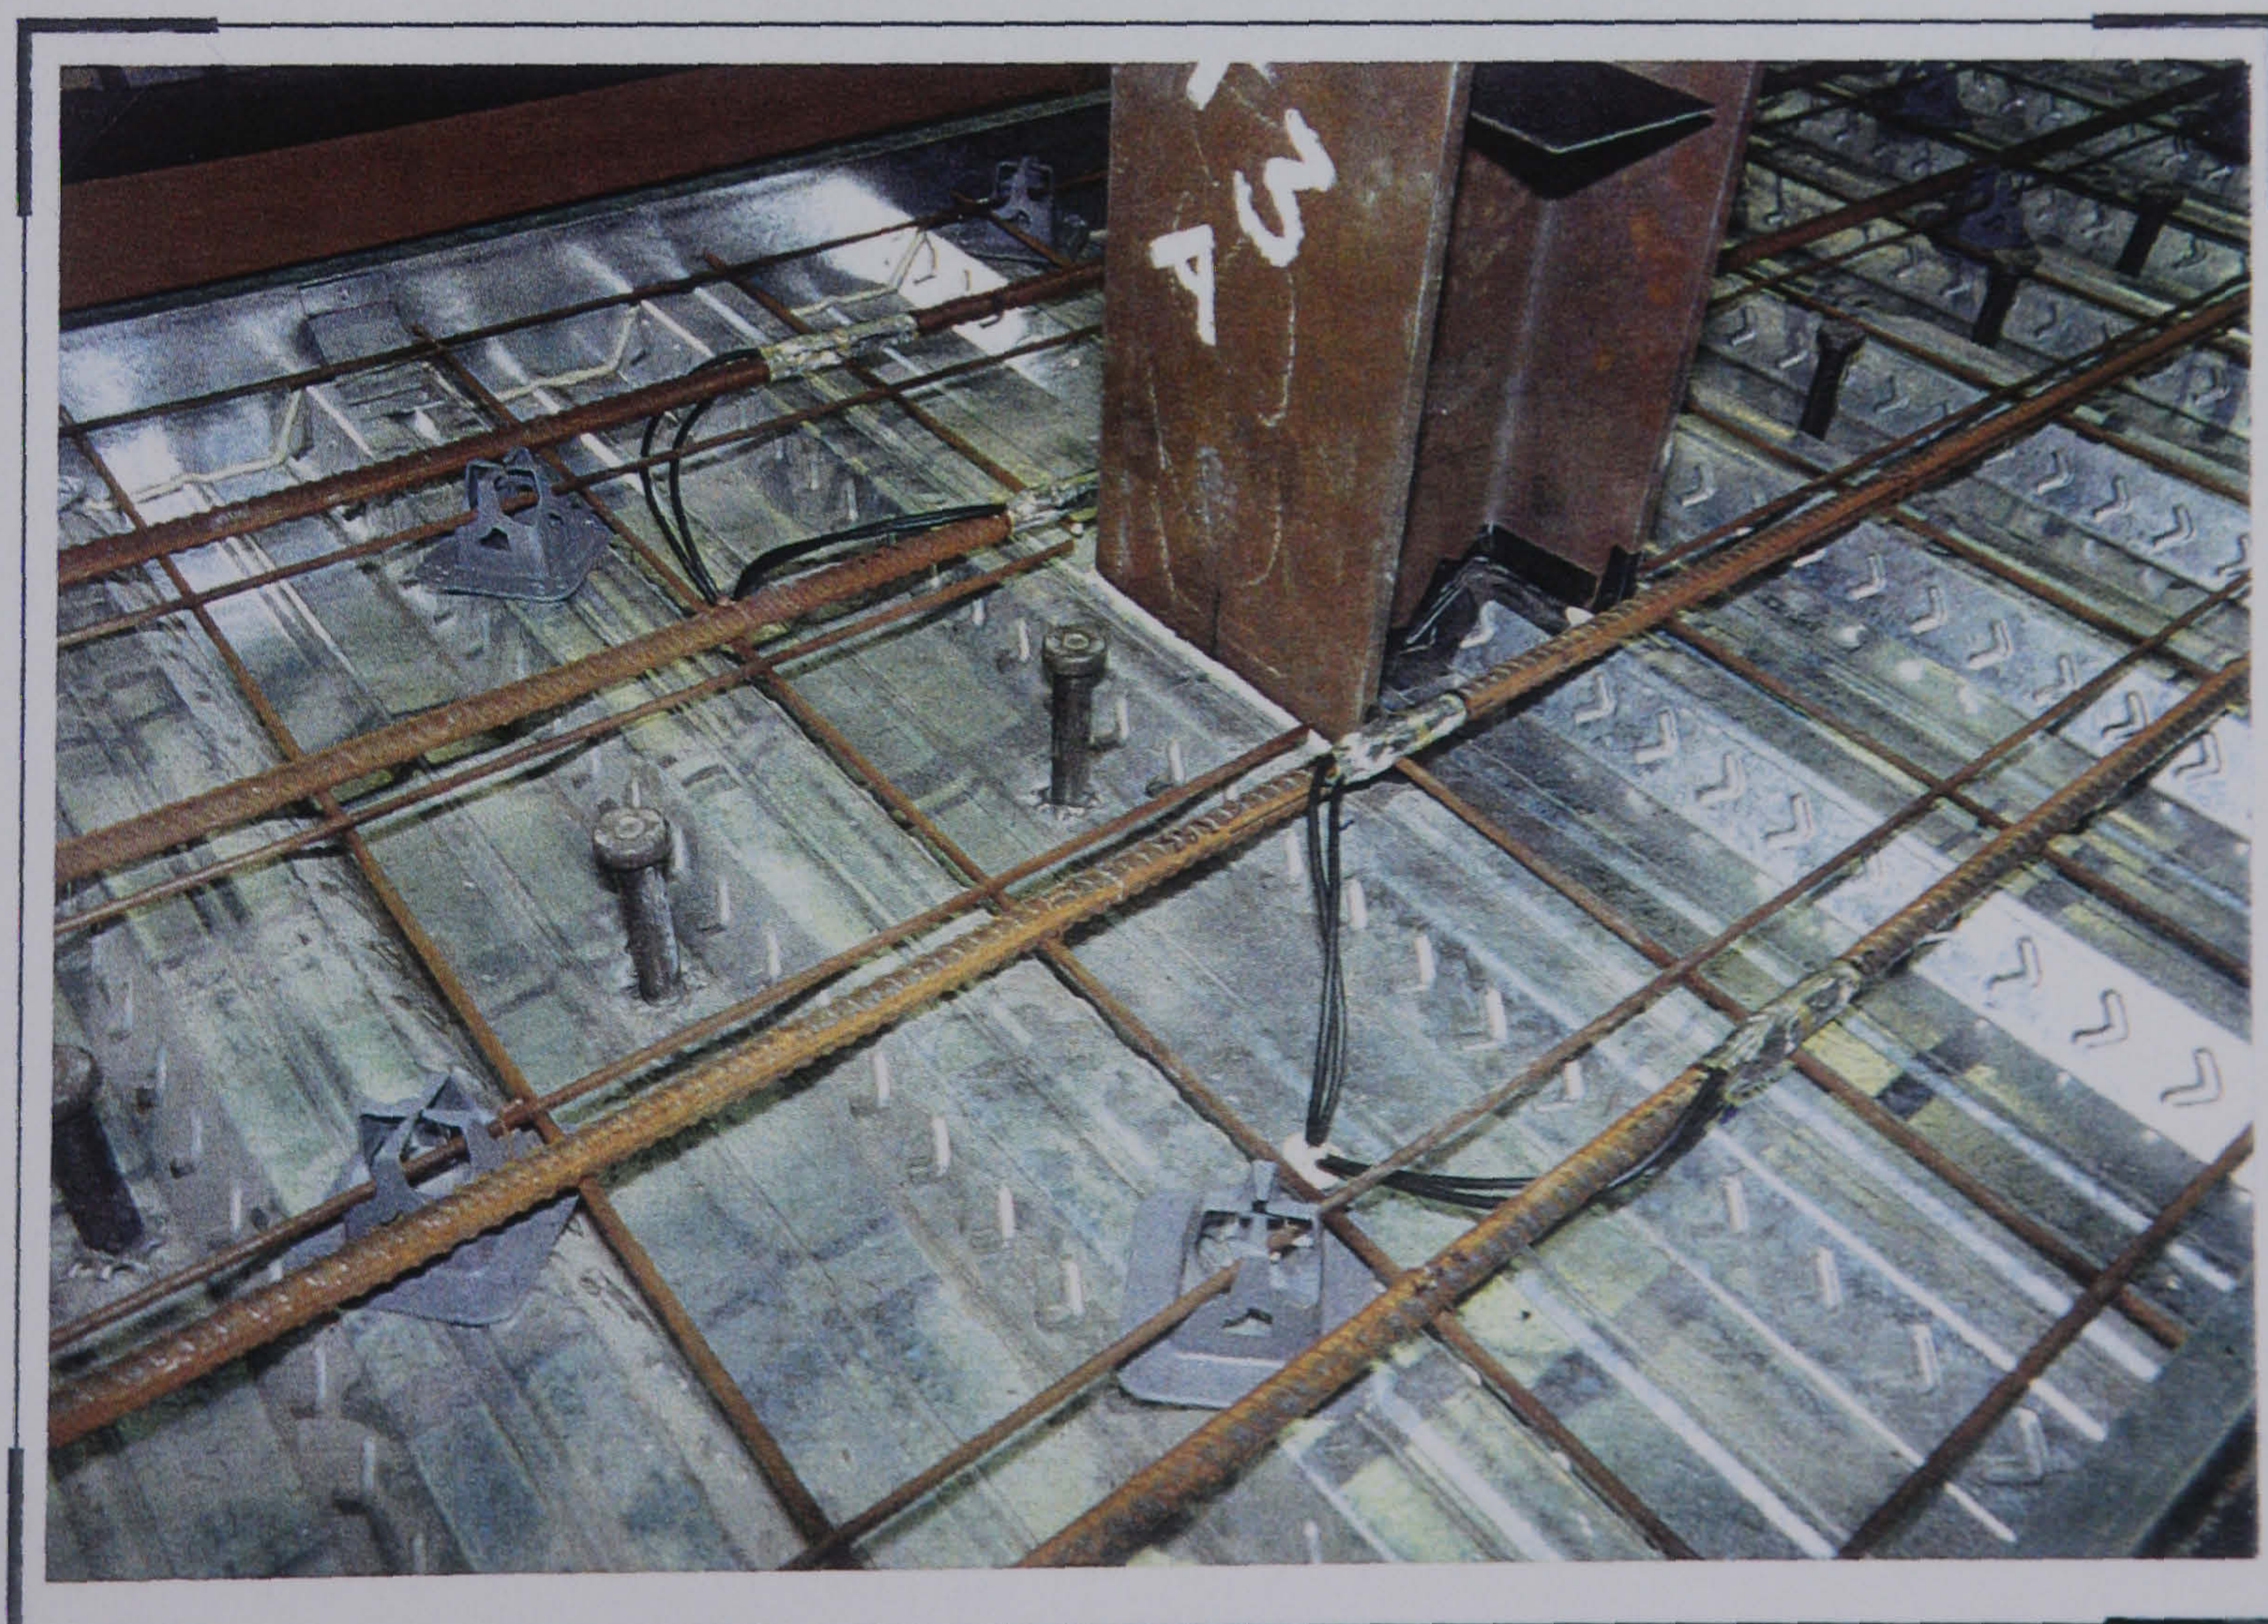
Strain gauge and shear stud positions within the concrete slab
